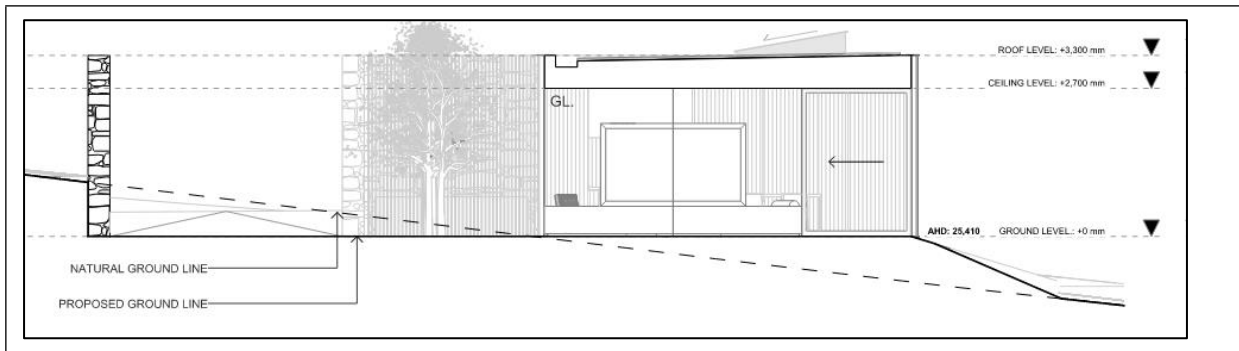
Proposal Plans – Northern Elevation – Dwelling & Retaining Wall
